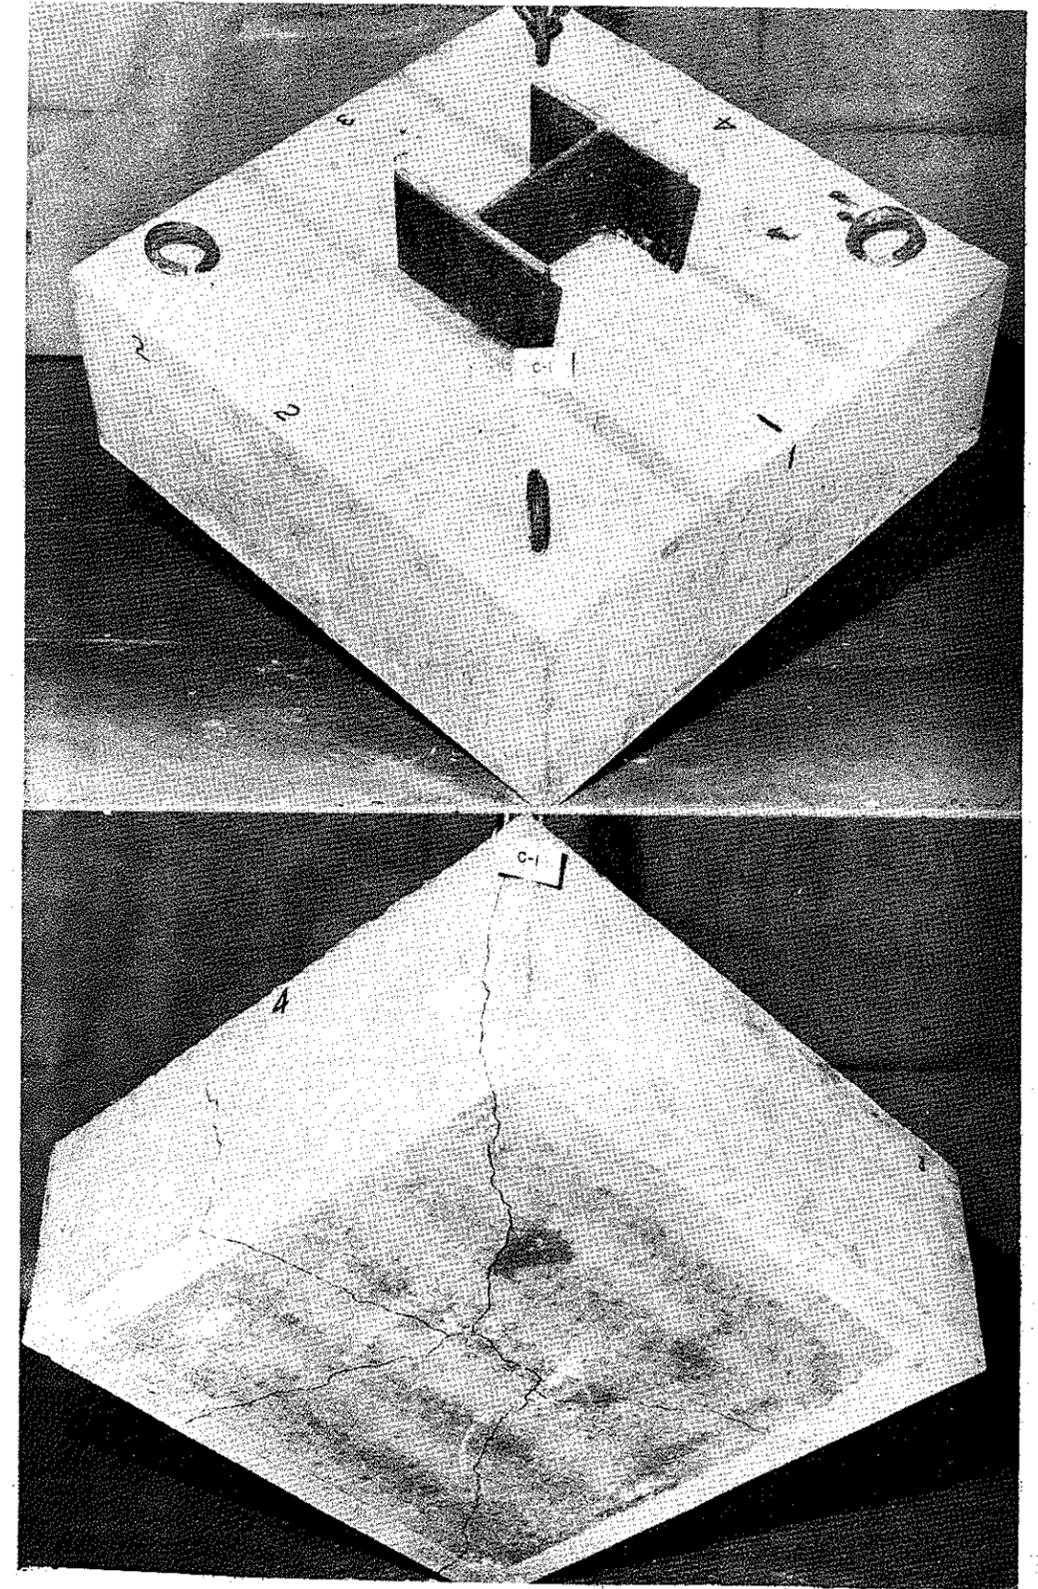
APPEARANCE OF SPECIMEN C-1 AFTER TESTING.
